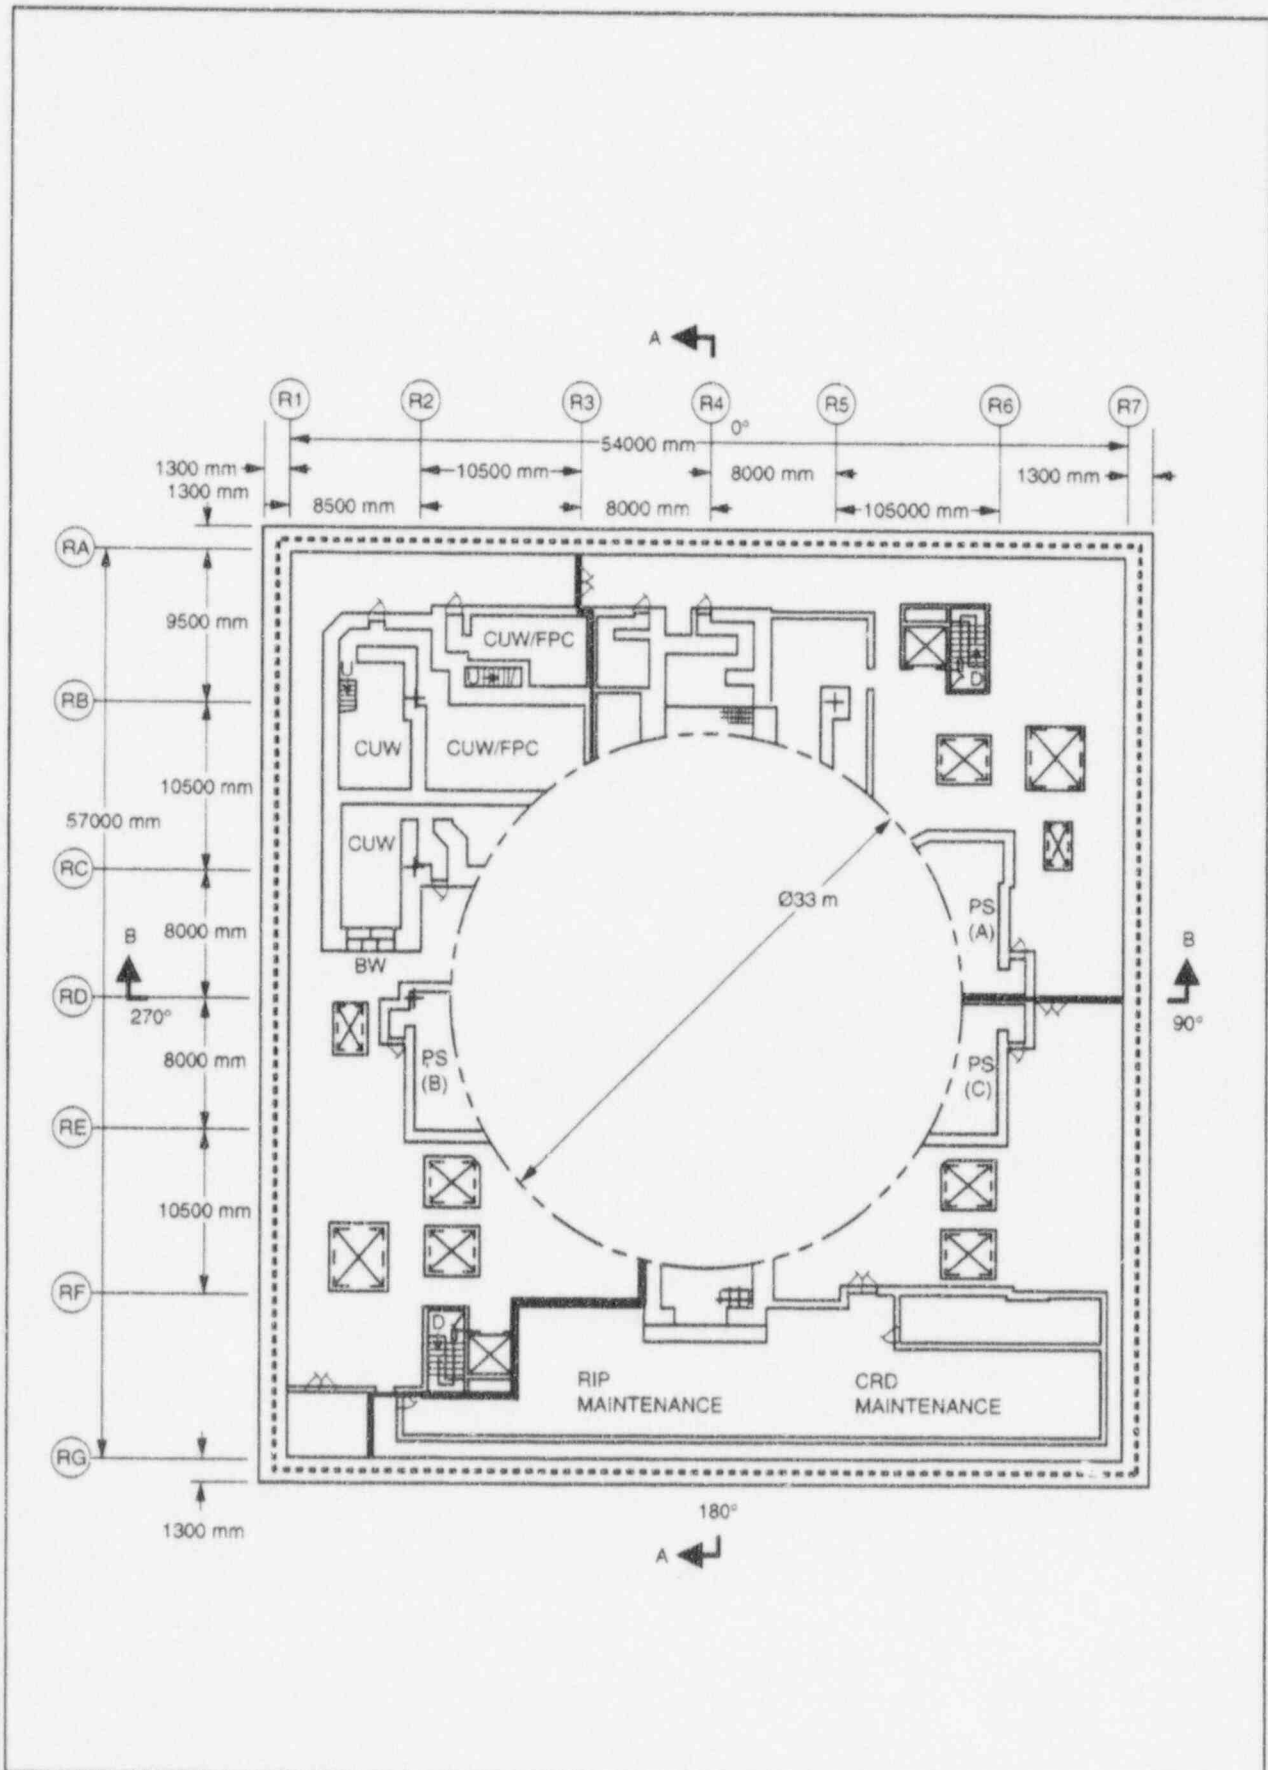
Reactor Building Arrangement, Floor B2F—Elevation -1700 mm
